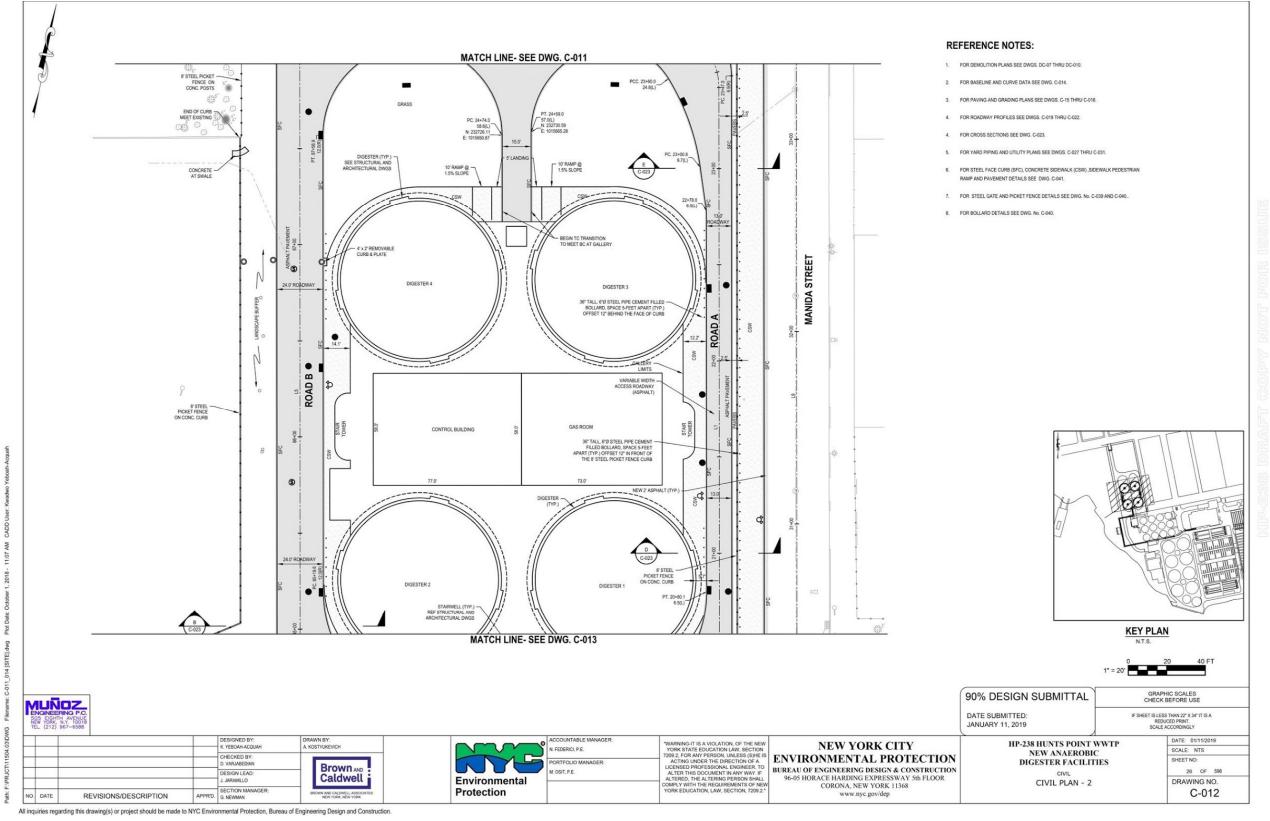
Project Plans displaying the proposed Digester facilities at the southern end of the APE (refer to Appendix A for additional site plans).
